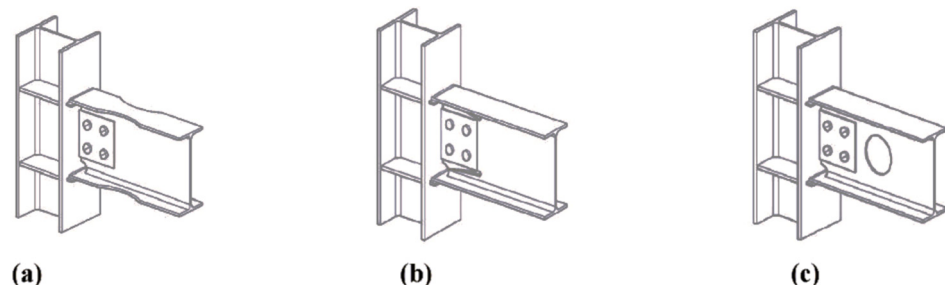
Weakened connections. (a) RBS; (b) Beam web slit; (c) Beam web opening.
